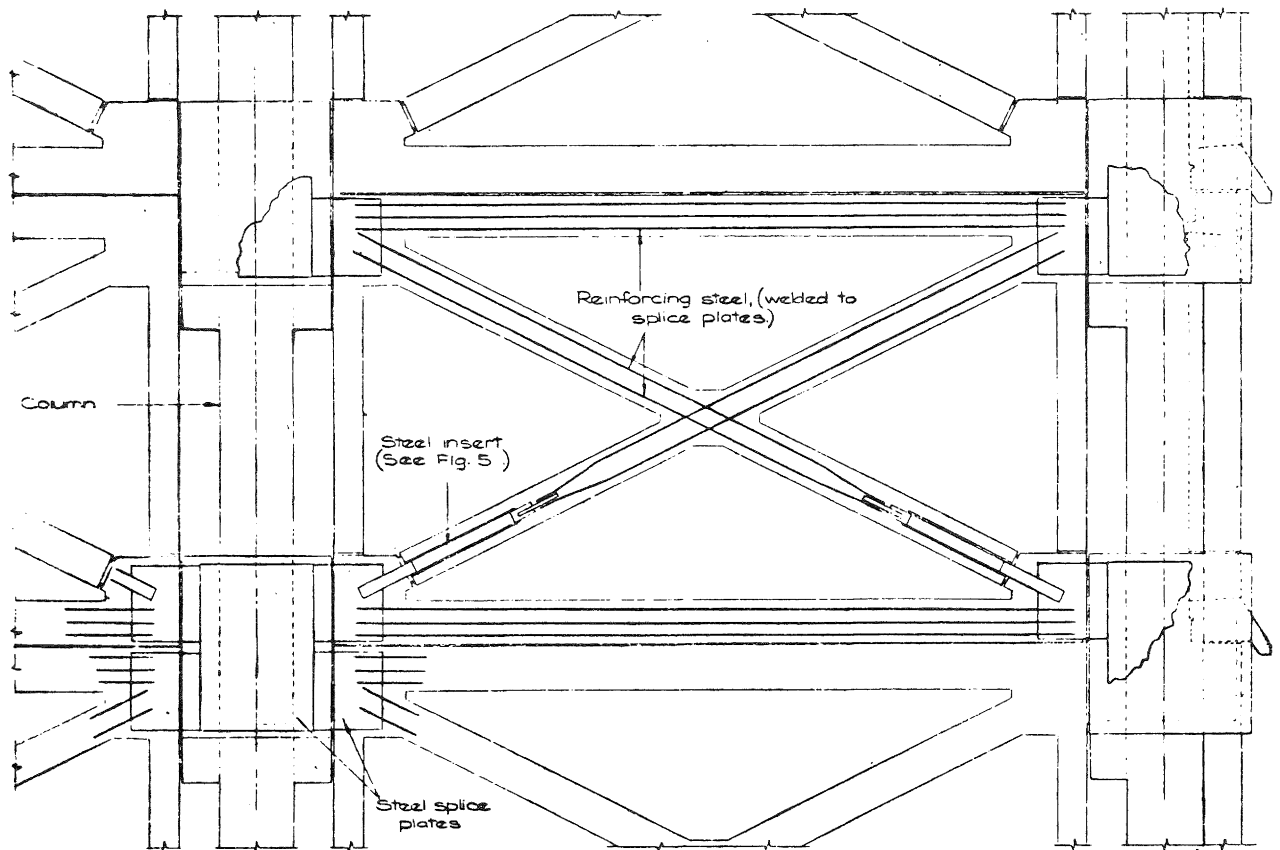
(a) Wanganui Building: Precast Concrete Wall Panel Details.
